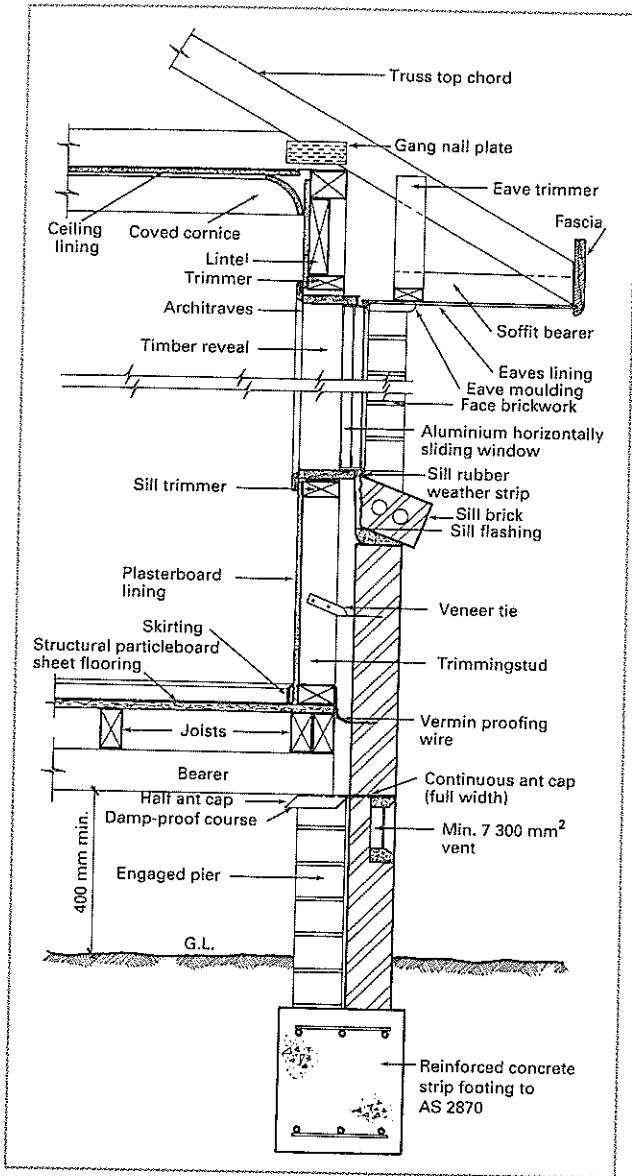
Vertical section through an external brick veneer wall and horizontally sliding aluminium window
